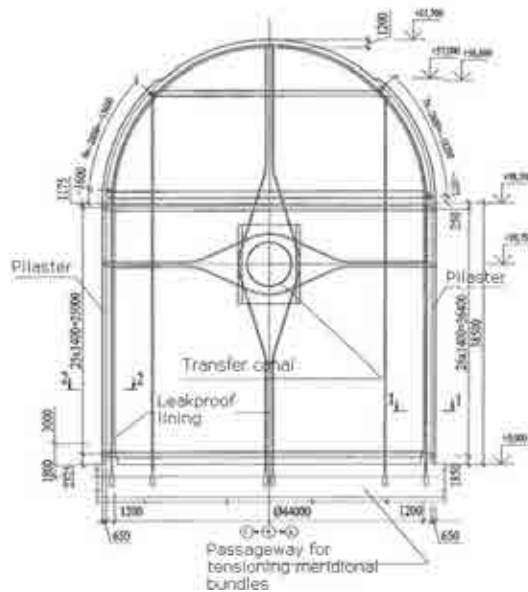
NPP-2006 inner containment shell and prestressed concrete strand arrangement in cylinder and dome (courtesy of Rosenergoatom).
